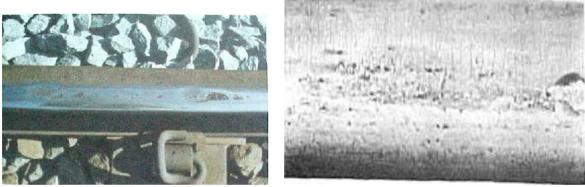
2252 - HEAD SURFACE, WHEEL BURN REPEATED
